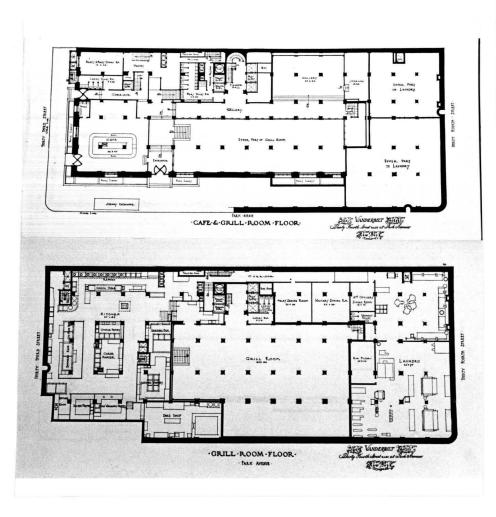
Historic plans of the Ground Floor ("Café & Grill Room Floor") and Grill Room Floor
